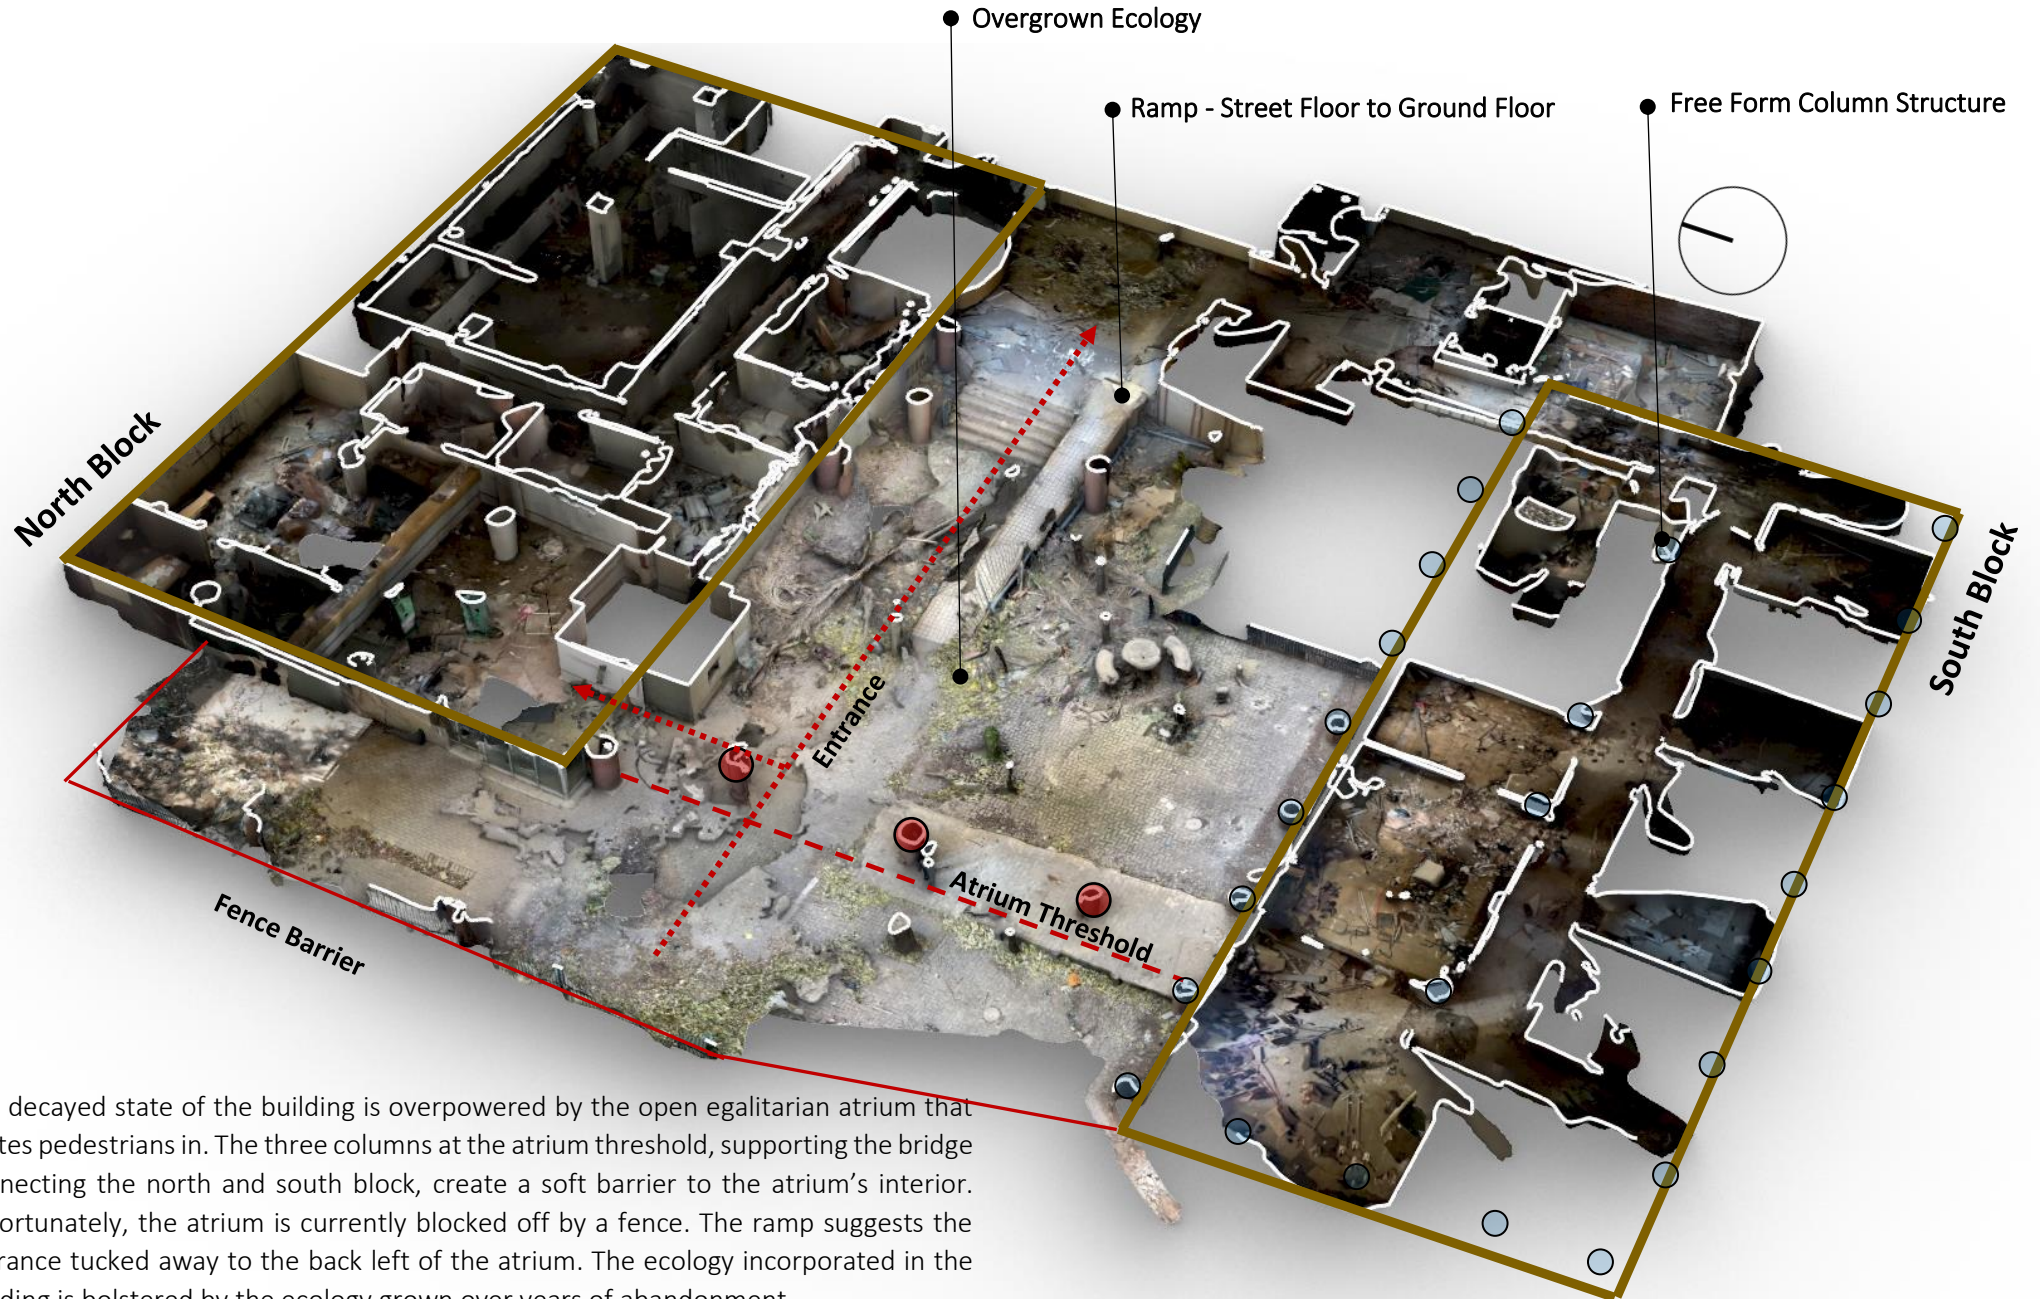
Ground Floor Plan of the Existing HB Philips Building
